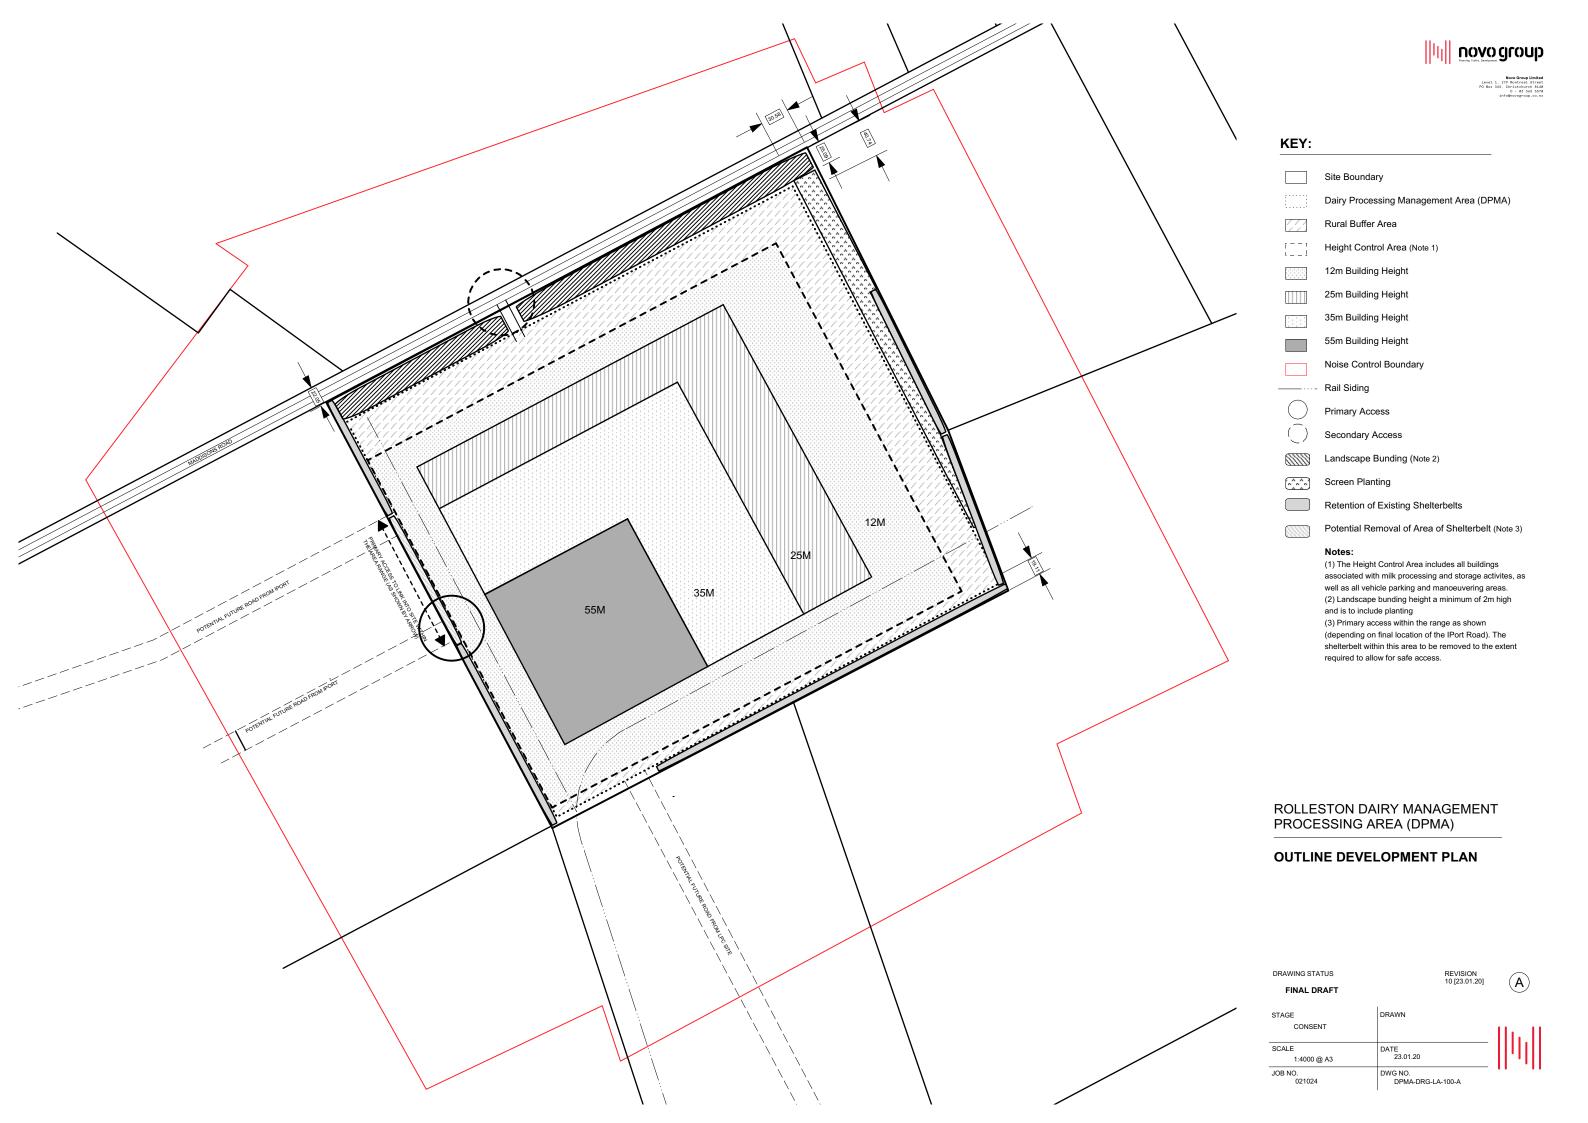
Example of mitigation planting / landscape buffering 20-metre-wide landscape bunding with planting shown
